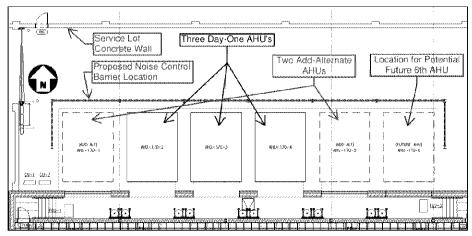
Partial plan view showing the layout and location of the proposed barrier wall.
